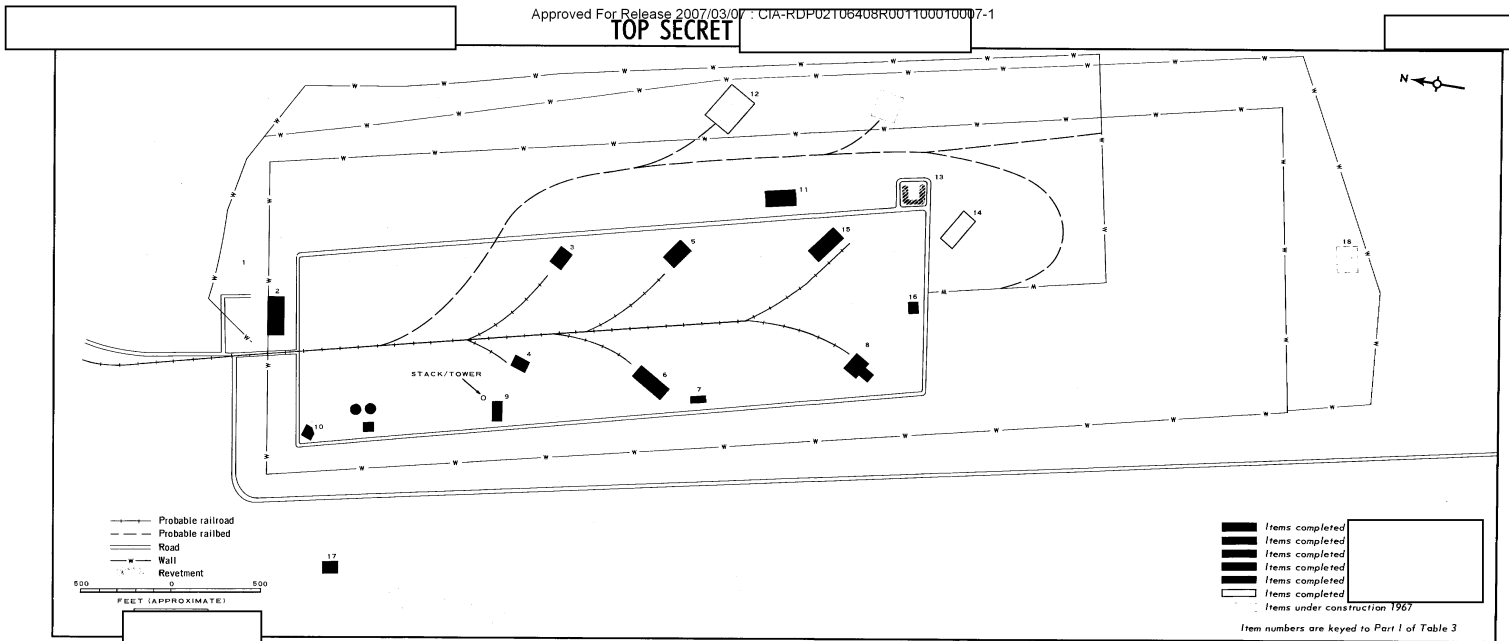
LAYOUT OF THE POSSIBLE RANGE SUPPORT FACILITY.
